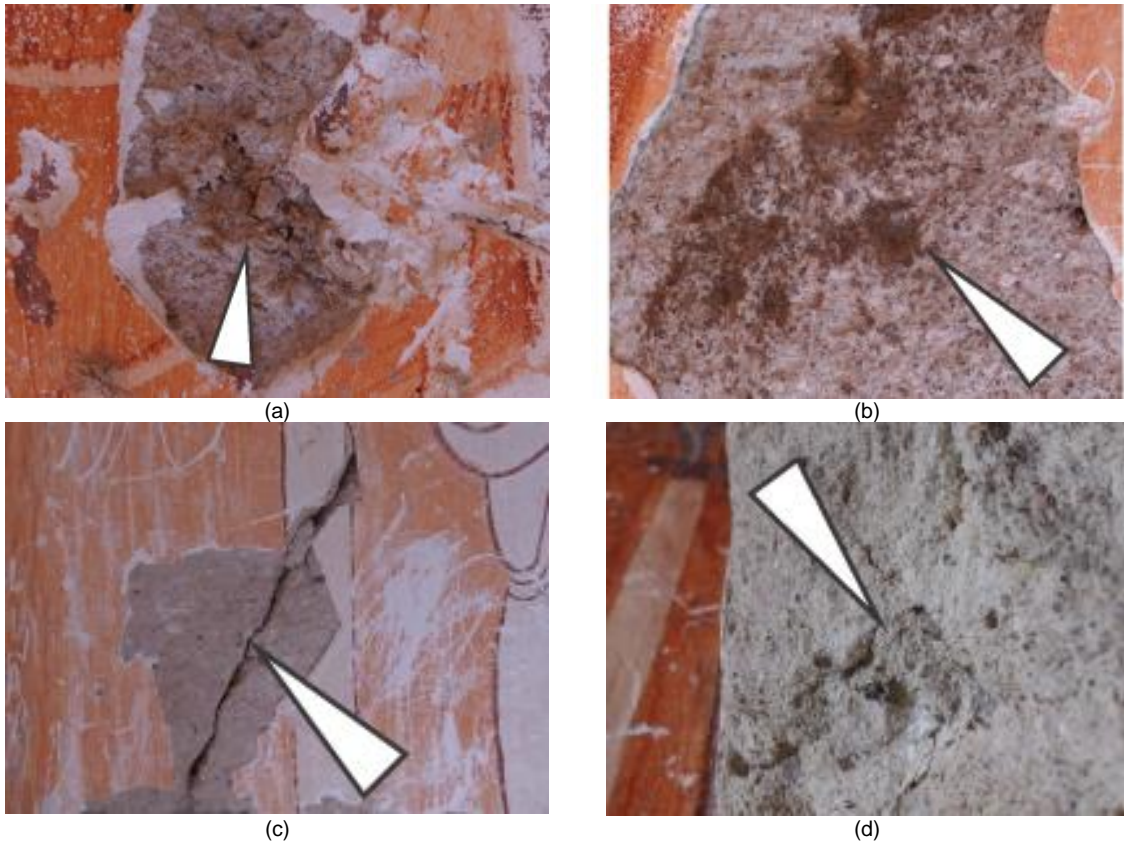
Photos of rock layer deterioration: a) Biological activity; b) Deposition of dark material; c) Structural cracks; d) Spalling.
